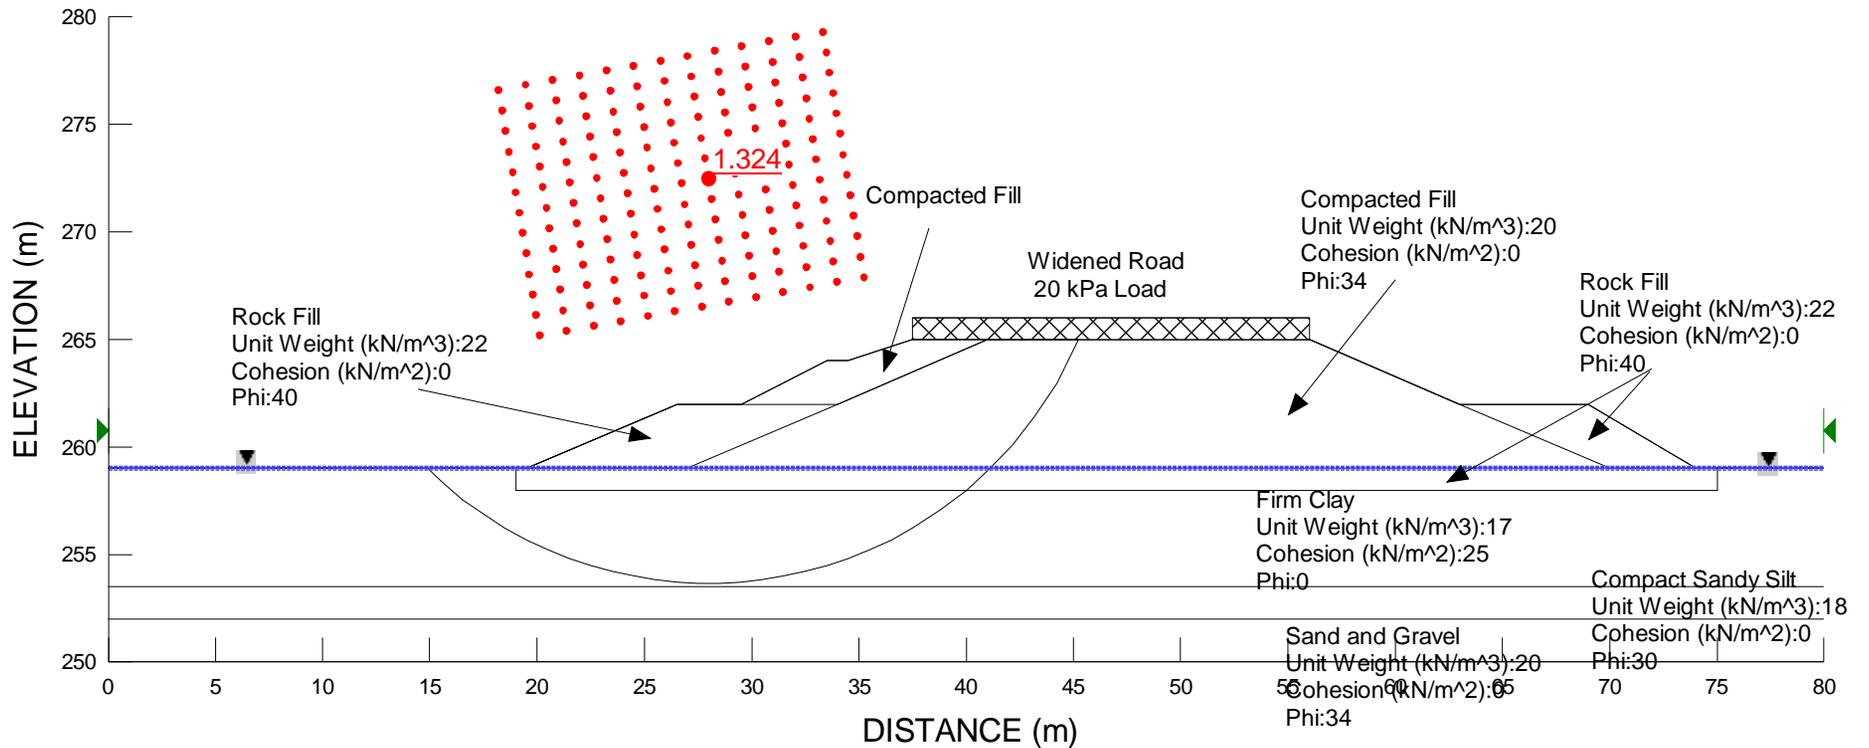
Slope Stability Analysis of Section at Station 18+875 with 3.5 m Road Widening (End of Construction)
